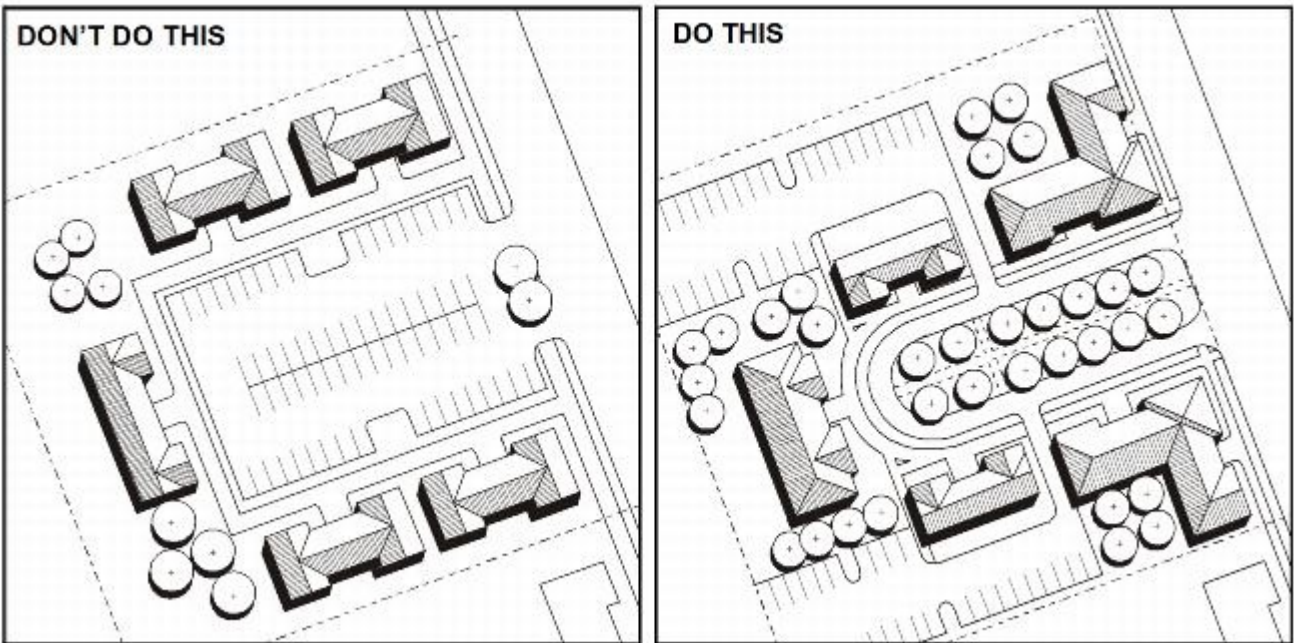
(E): Examples of breaking up parking and siting it behind buildings. Such development creates an attractive open space and avoids the impact of a large central parking lot.
